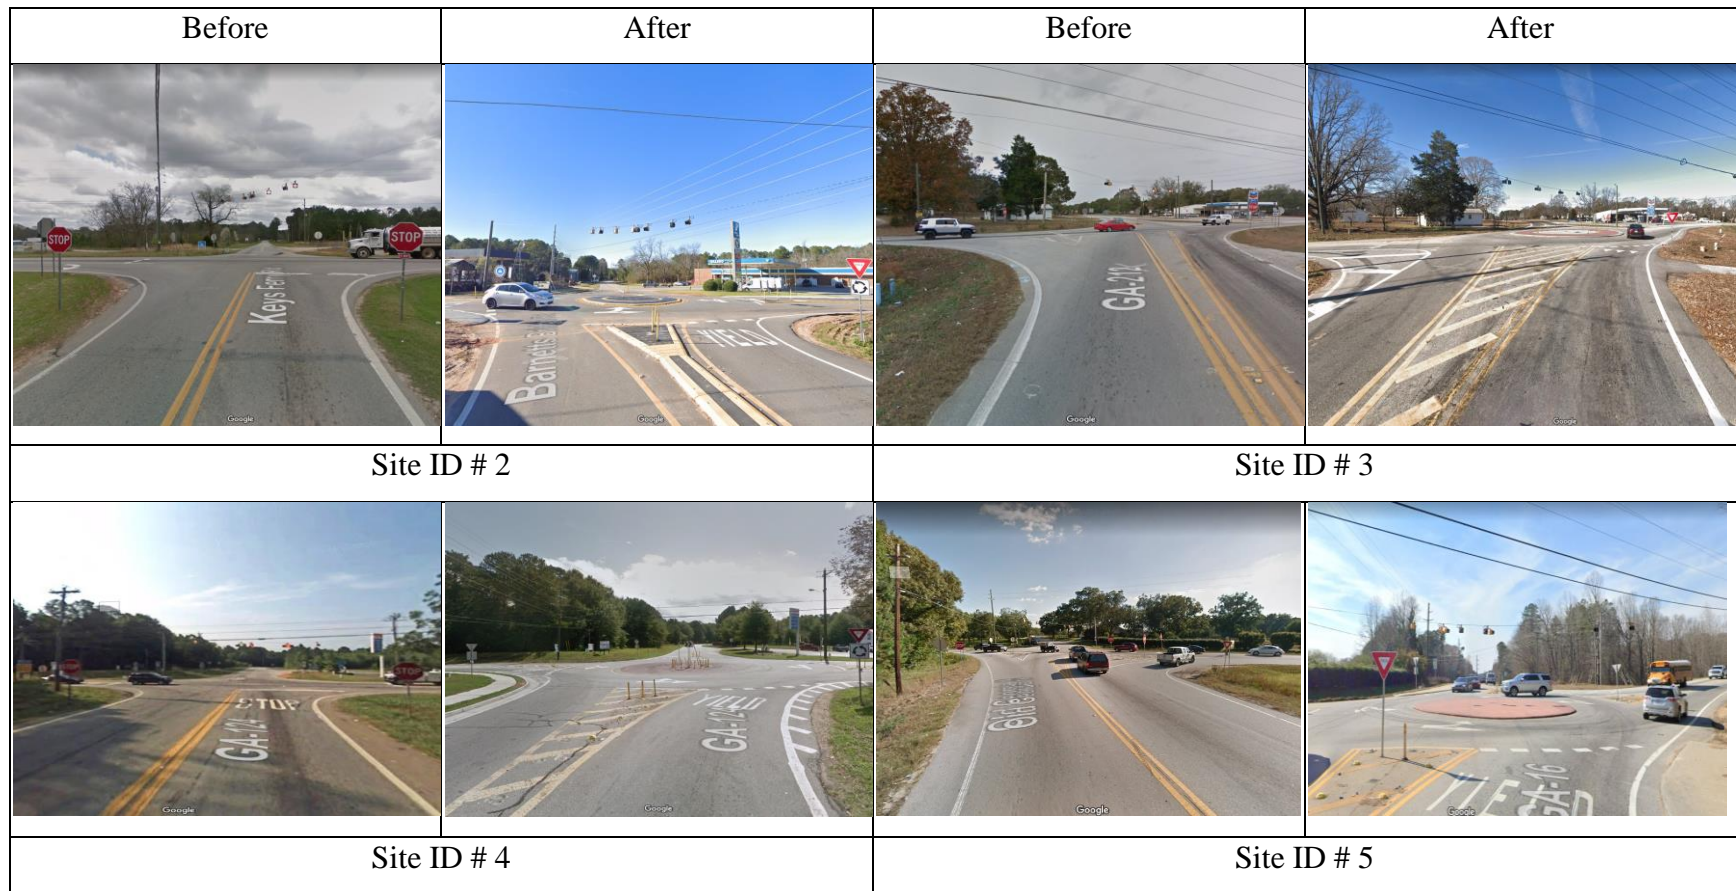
Before and after pictures of TWSC intersections converted to mini-roundabouts (© Google street view).
